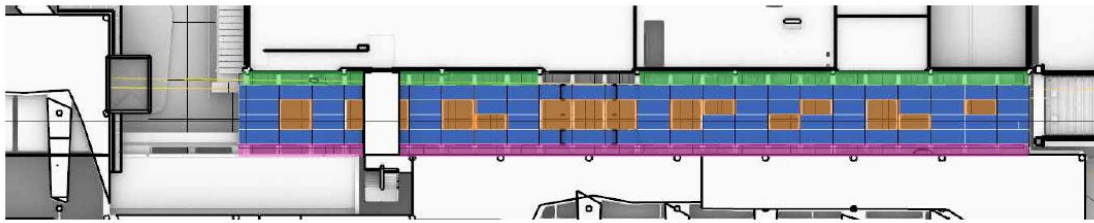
Part retail Ground Level floor plan – Location of proposed works
